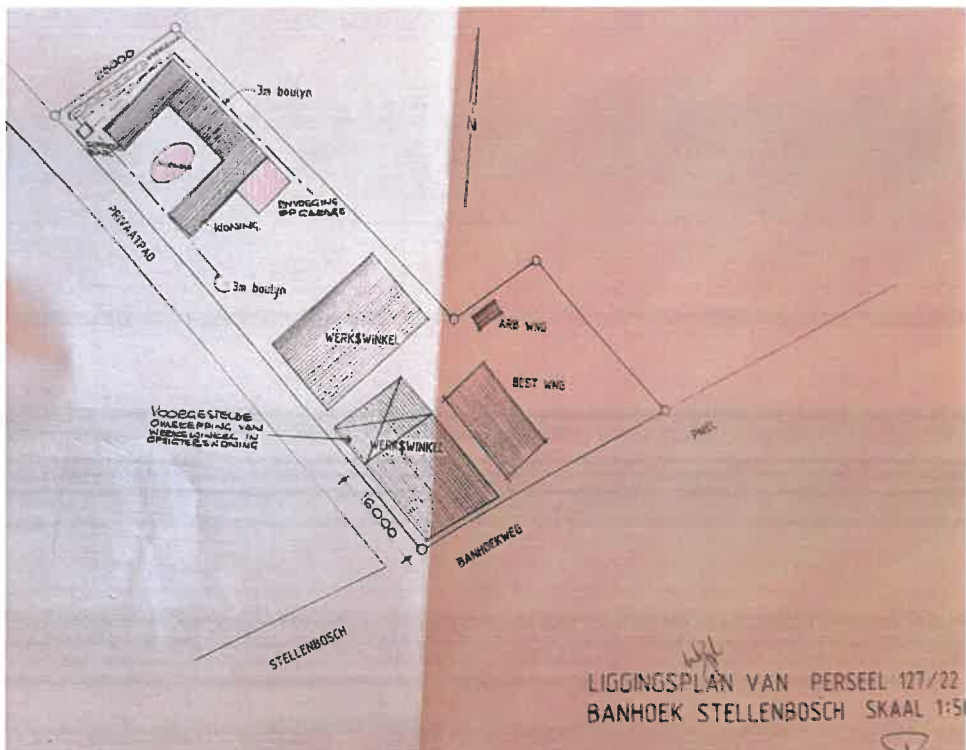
Extract from approved buiding plan, building plan number 21294/92
